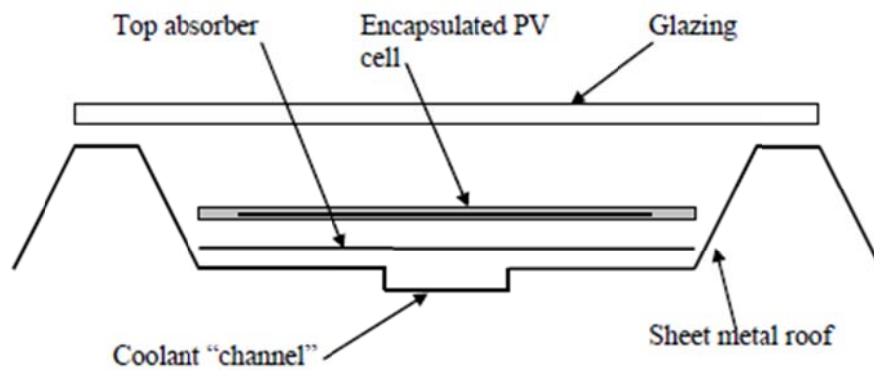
Cross sectional view of the assembly explosion for the collector investigated by Anderson [9].
